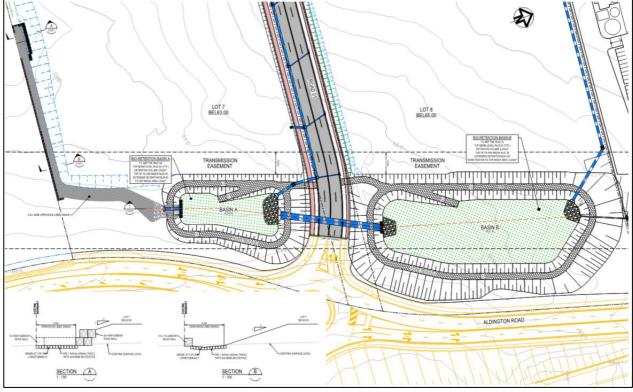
Bio-retention basin A and B detail plan (Source: At&l 2021)
